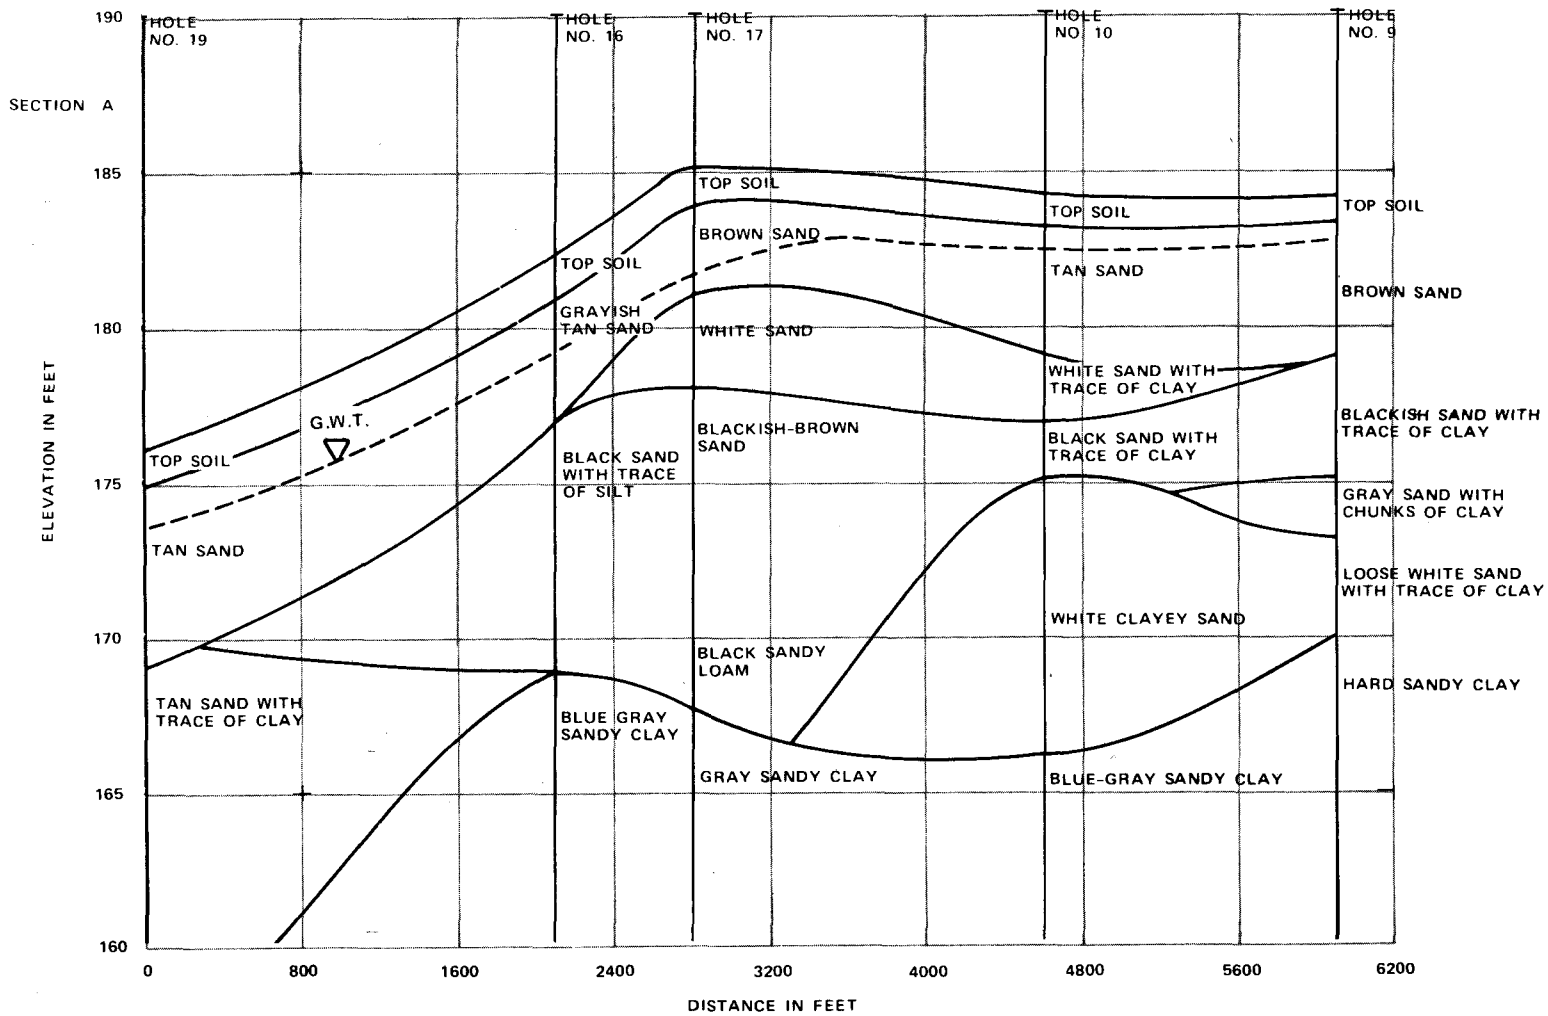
INFERRED STRATIFICATION IN SELECTED CROSS-SECTIONS OF DEERHAVEN SITE.
